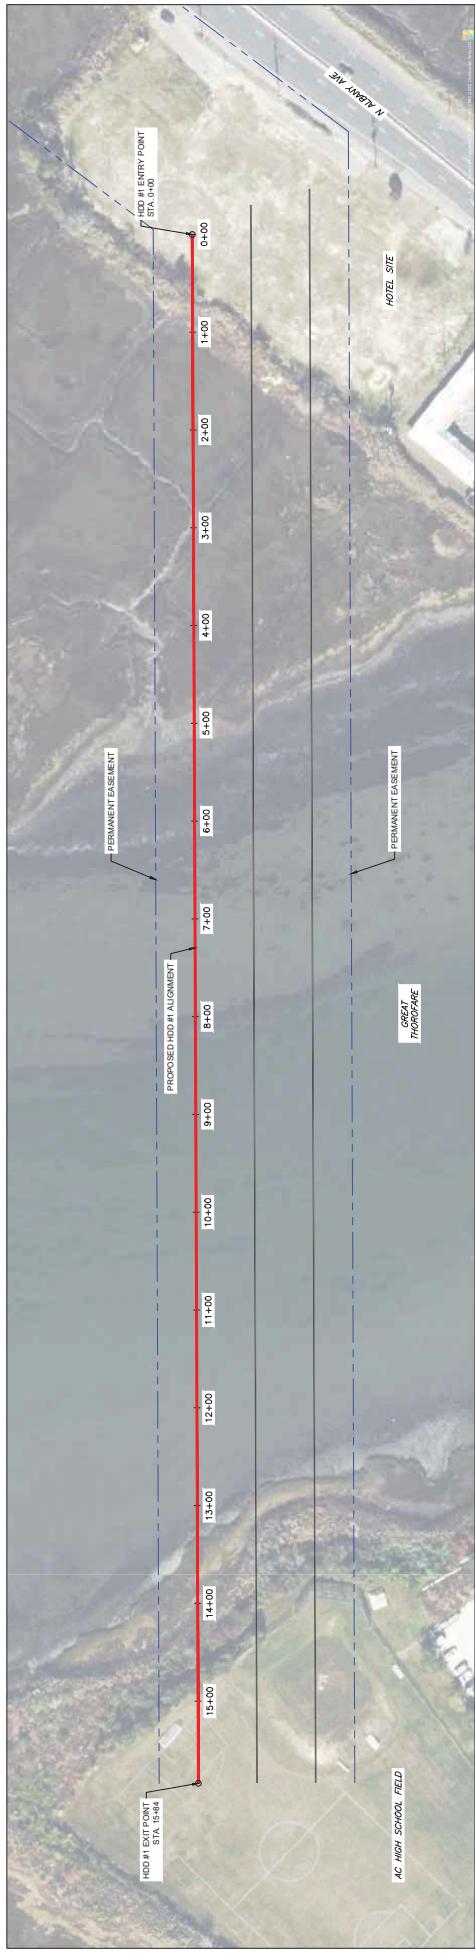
Great ThoroFare Crossing #5 HDD Plan & Profile
